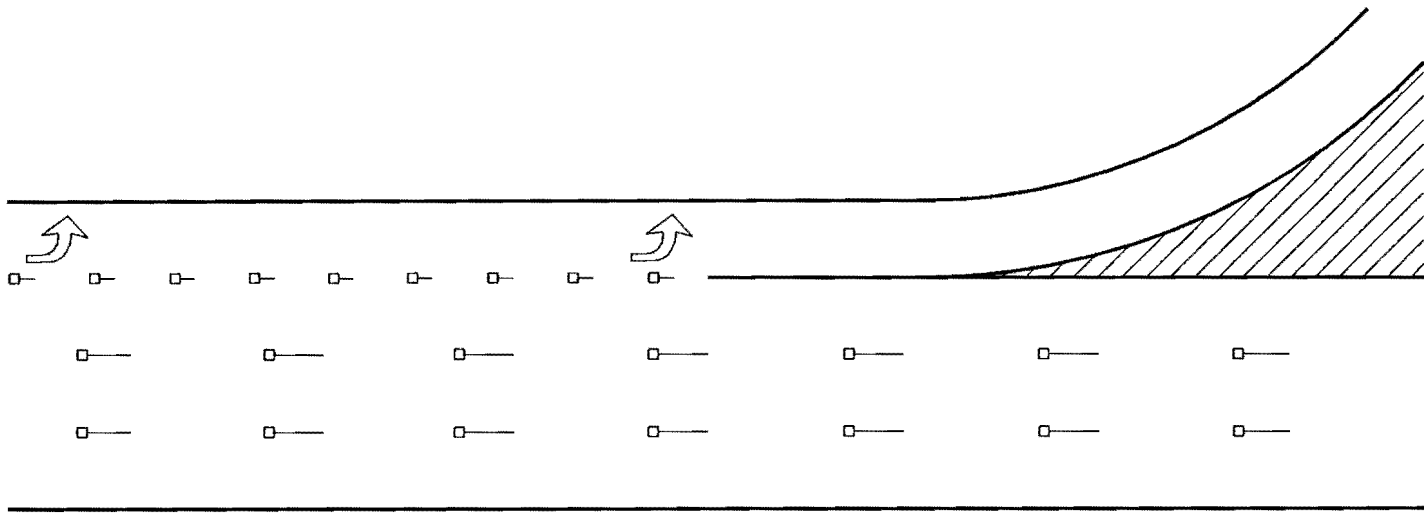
Raised Pavement Markers and Pavement Arrows at the Site.
